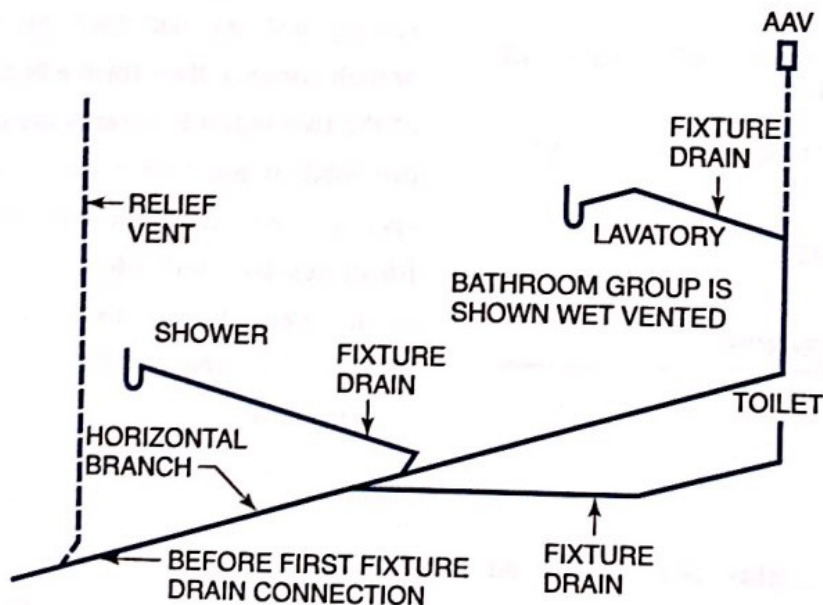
Some codes mandate that a relief vent be installed when an air admittance valve is used to vent a drainage branch
